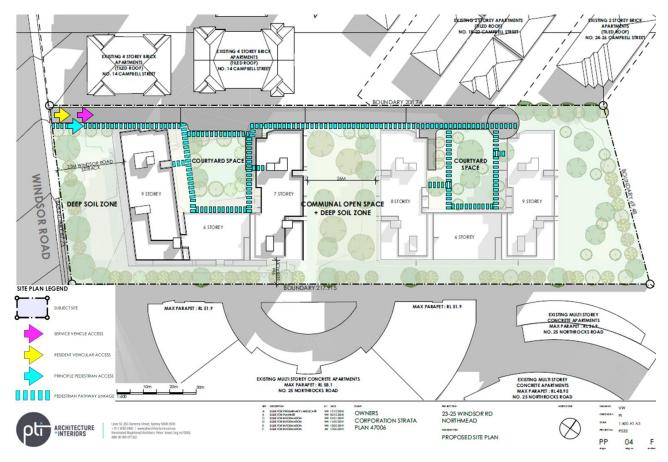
Site Reference Plan, 23-25 Windsor Road Northmead (Source: PTI Architecture)
